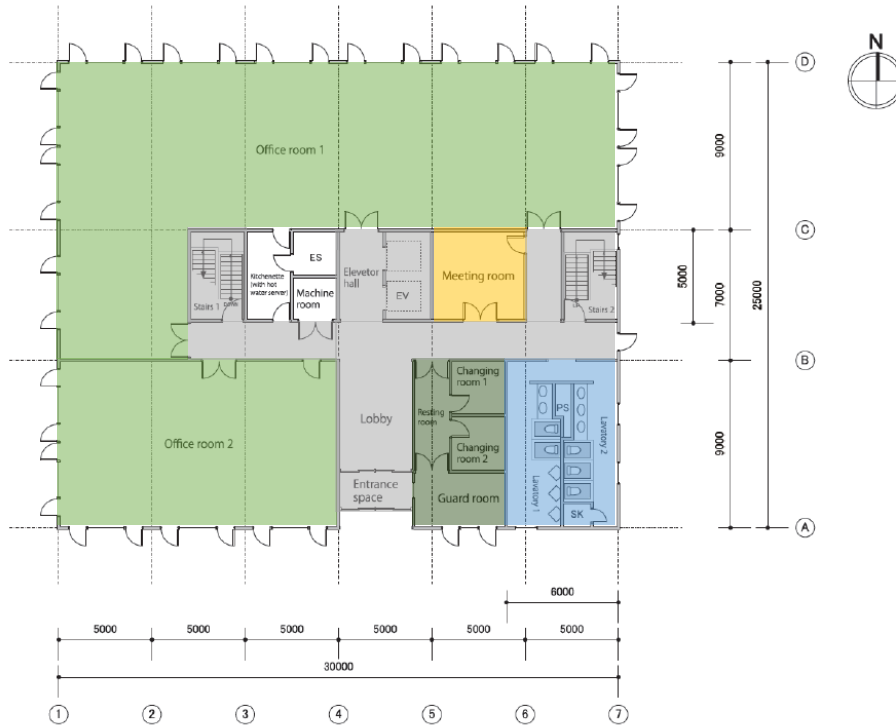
Second case study layout division of ISO 18523-1-2016 - Ground floor
